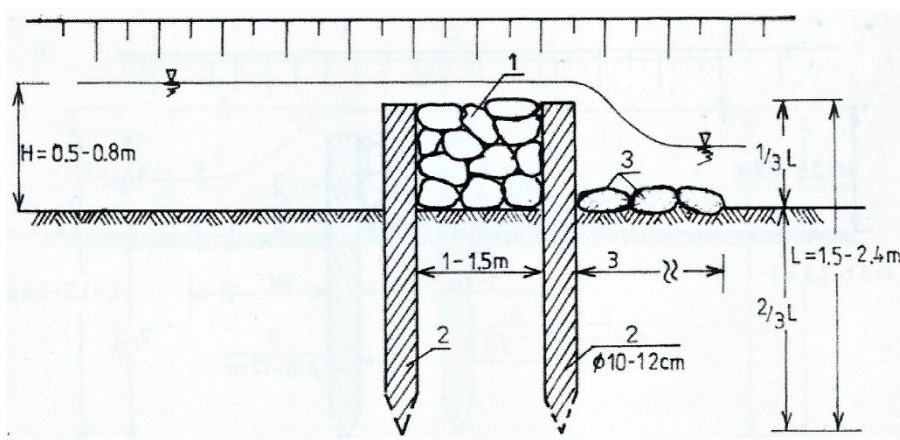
Sills made of wooden pales and stones: 1 and 3 – stones, 2 – wooden pales. Figure by Waldemar Mioduszewski.
